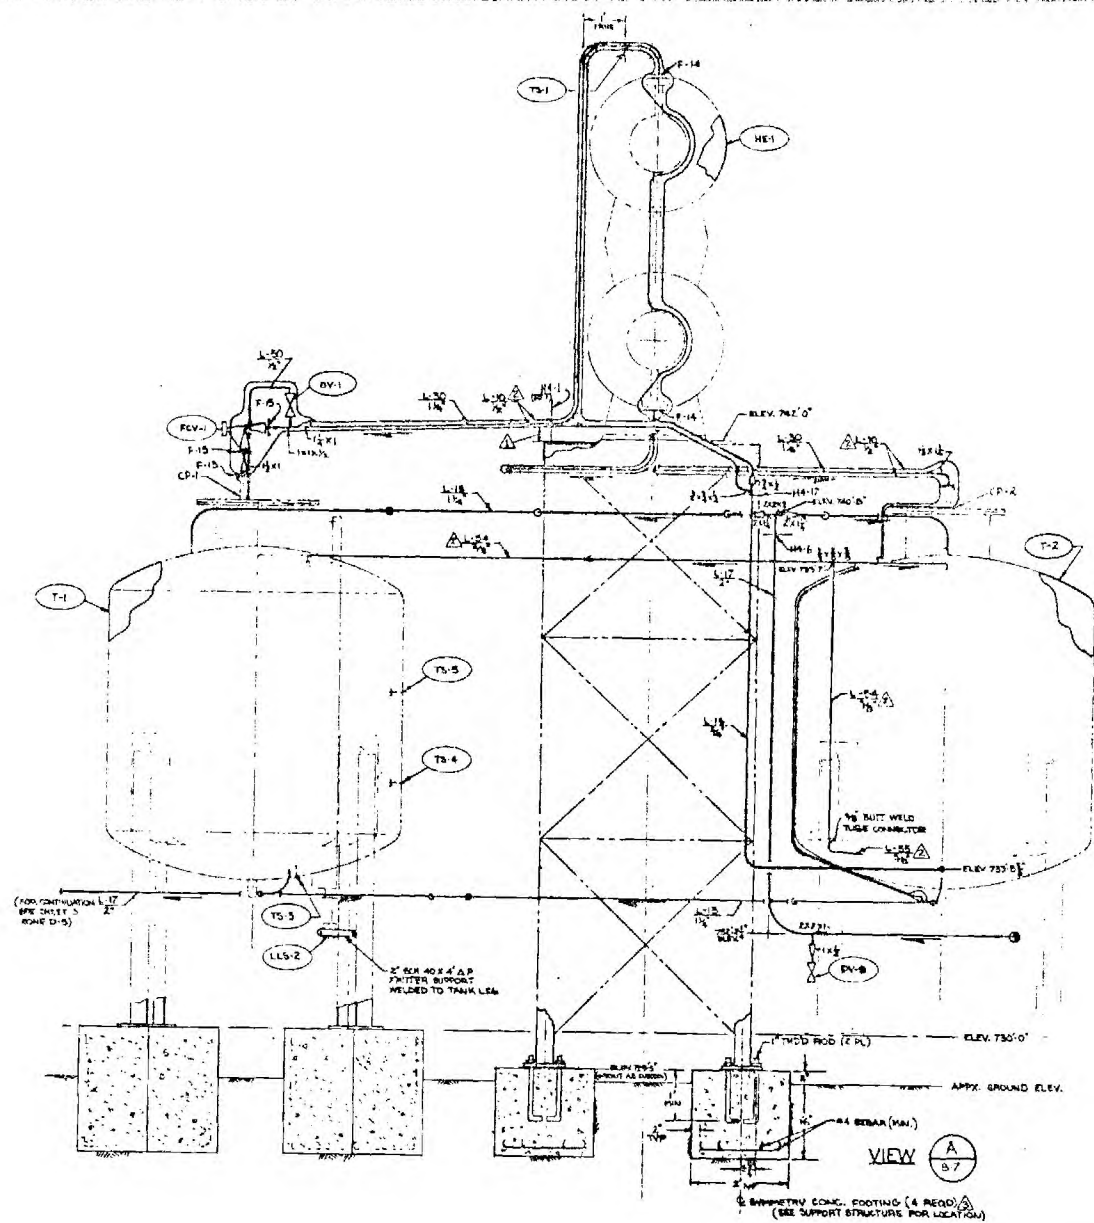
Plan View of Heat Storage Salt Piping System.
